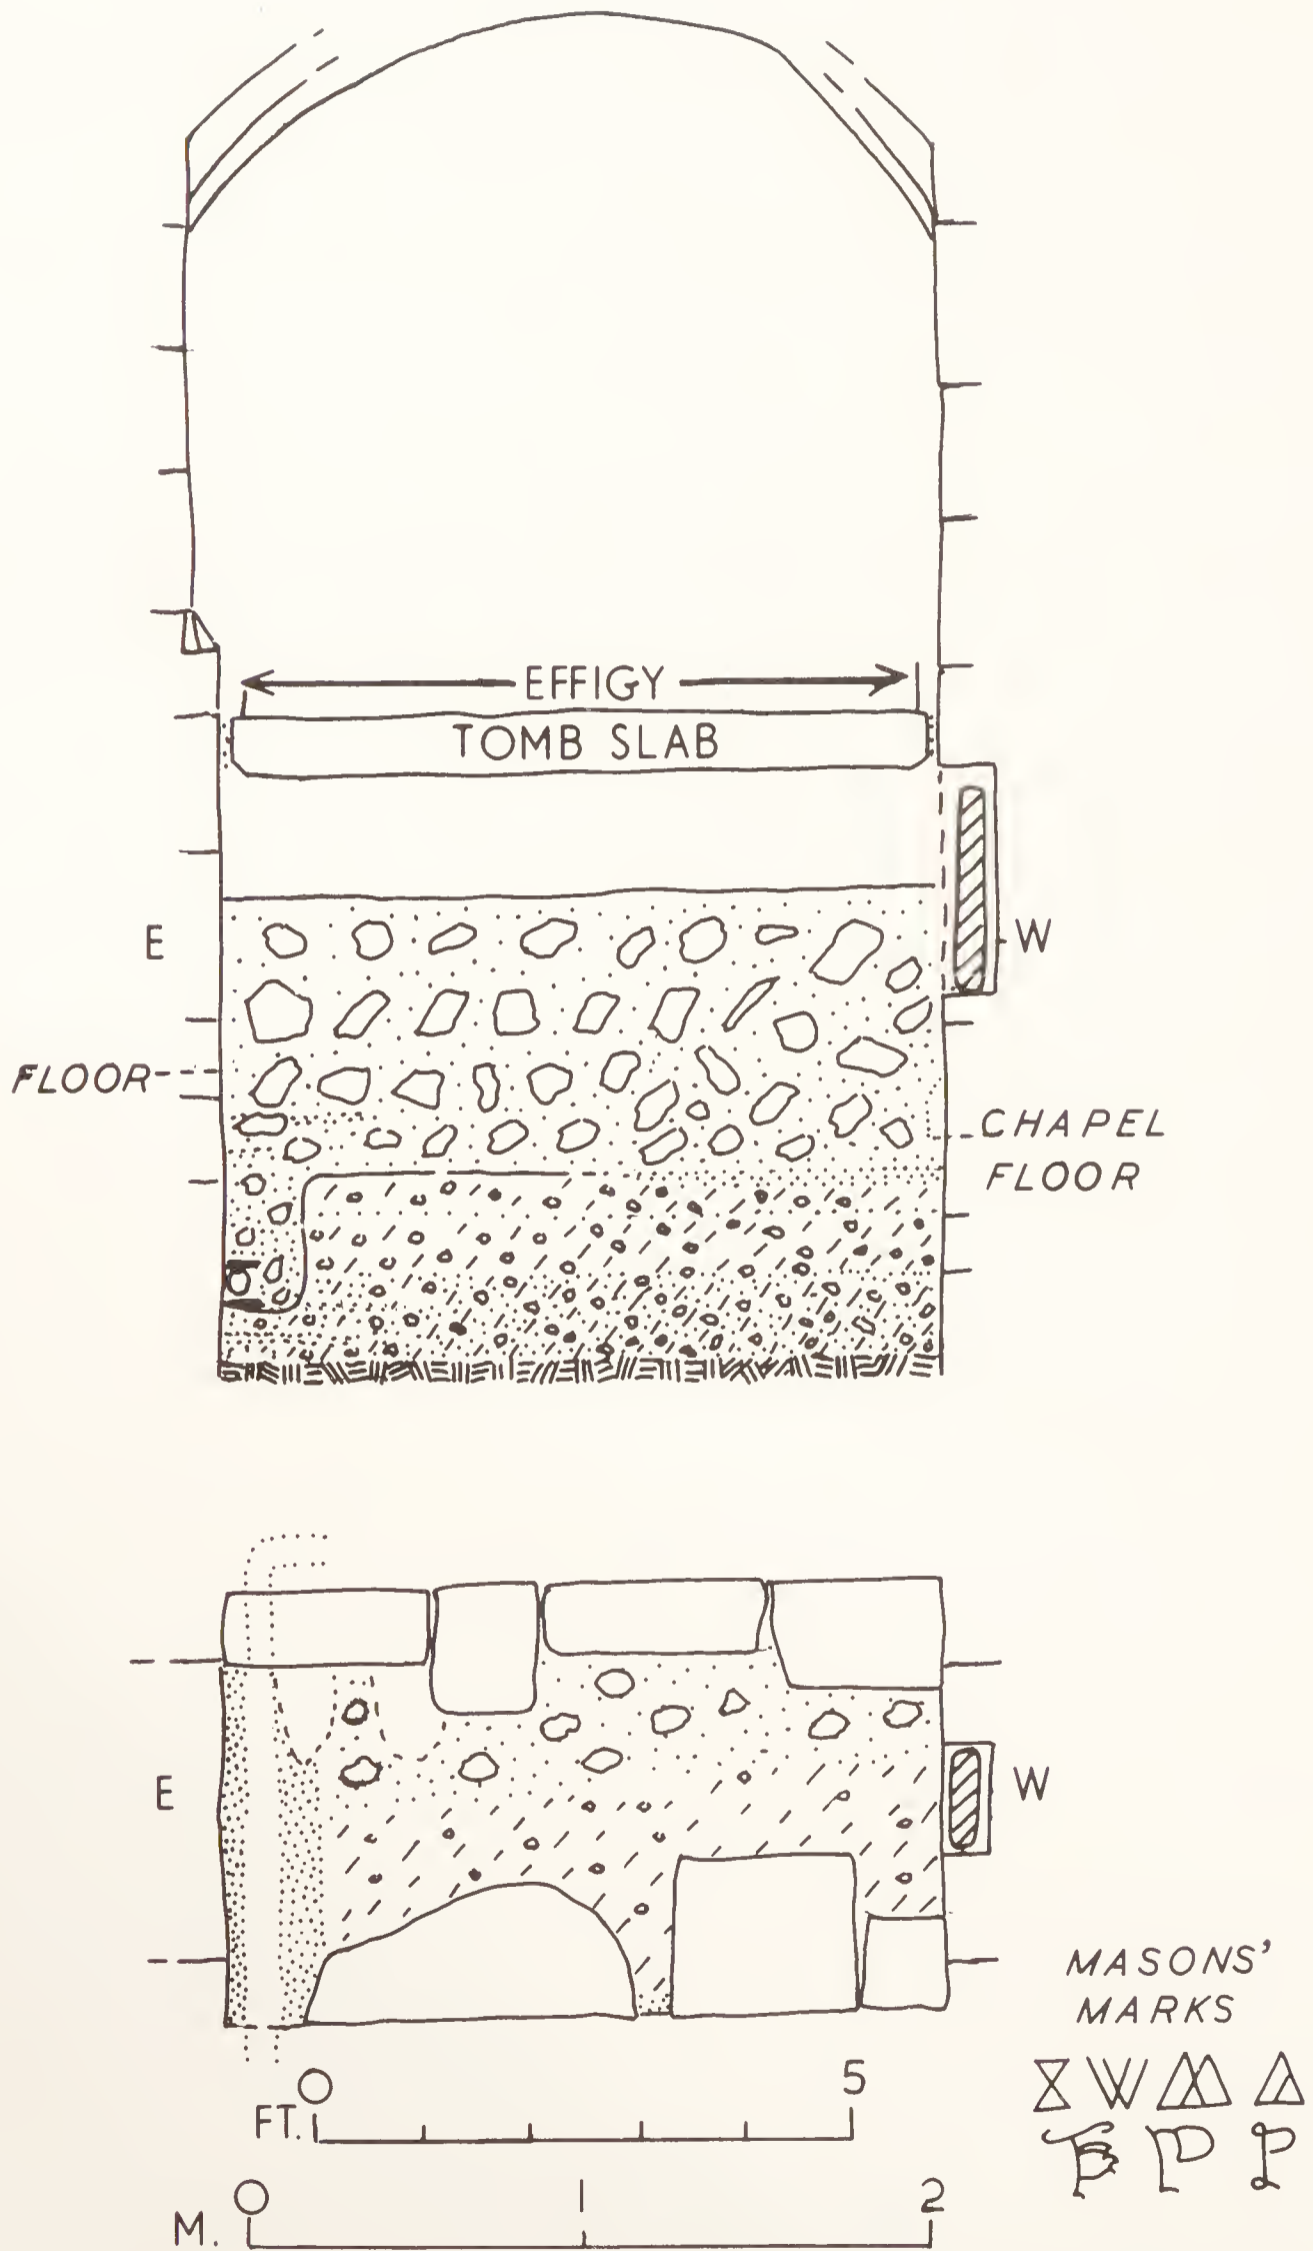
Harewood Church: plan and section of south tomb, looking south
